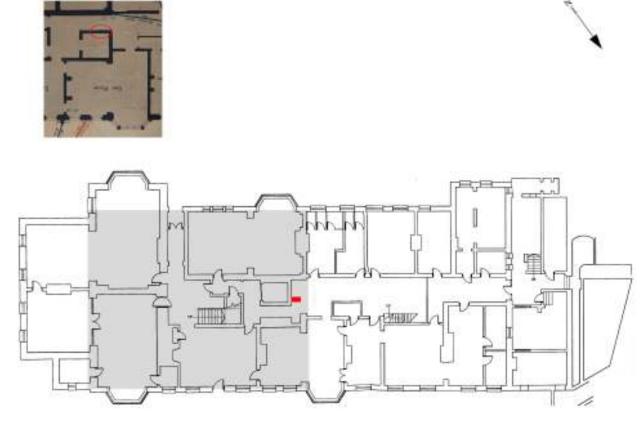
Plan of the modern house, showing the location of wall (112), alongside the 1894 Architects Plan with this wall ringed.
